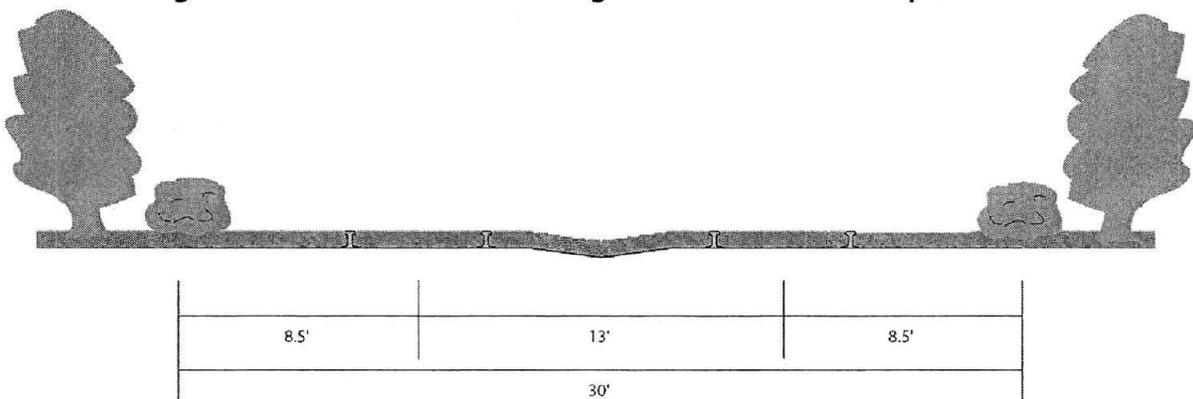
Light Rail Transit with Landscape Buffer – Newark, New Jersey
